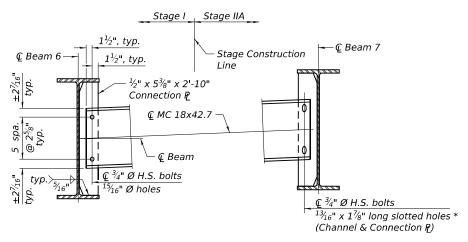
PLATE CONNECTION DETAIL FOR DIAPHRAGMS
